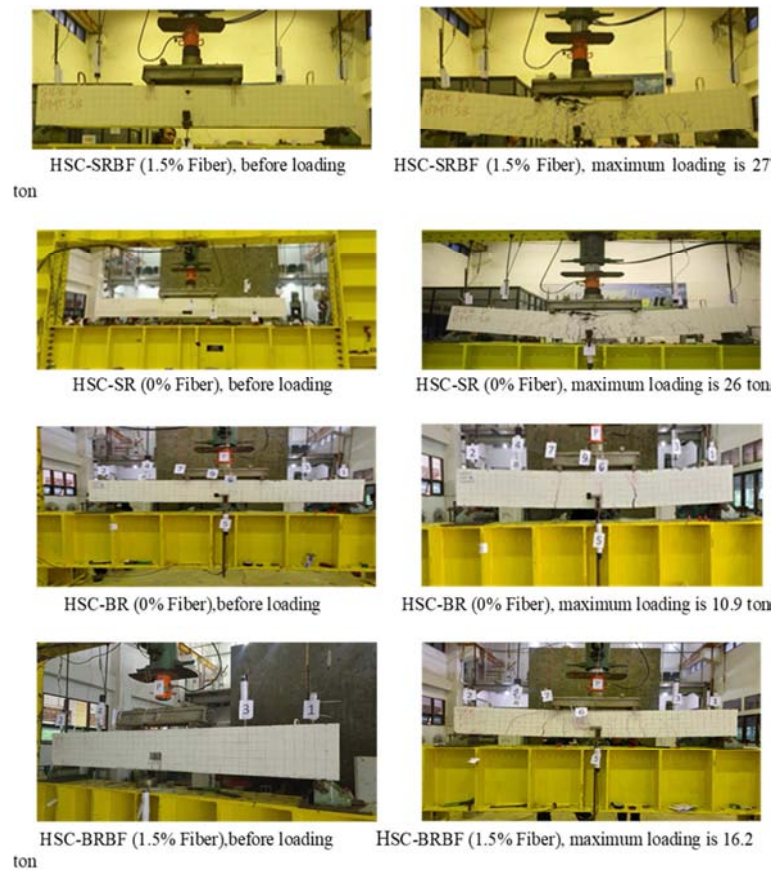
Load and Deformation Bamboo Reinforced Concrete Beam.
